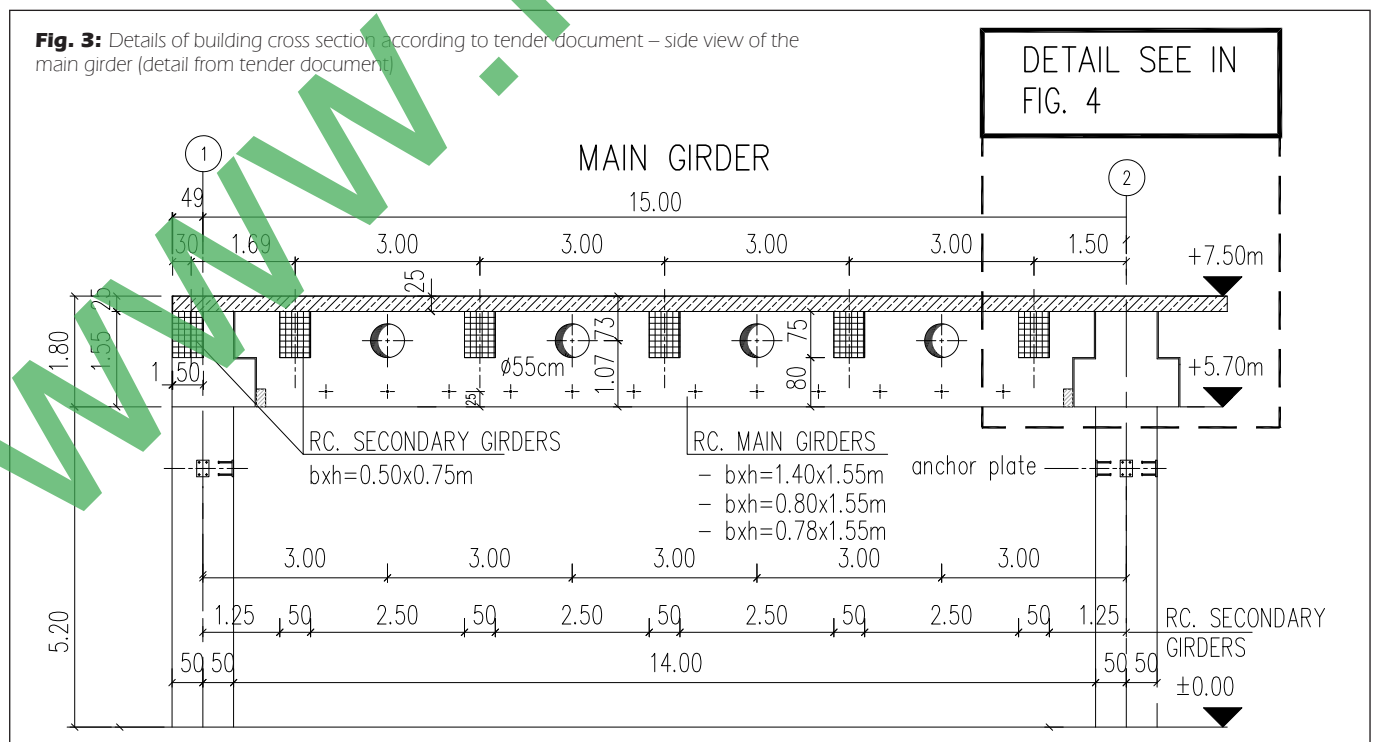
Details of building cross section according to tender document - side view of the main girder (detail from tender document)
